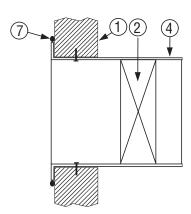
Out of Wall damper with flanged sleeve for grille mounting
